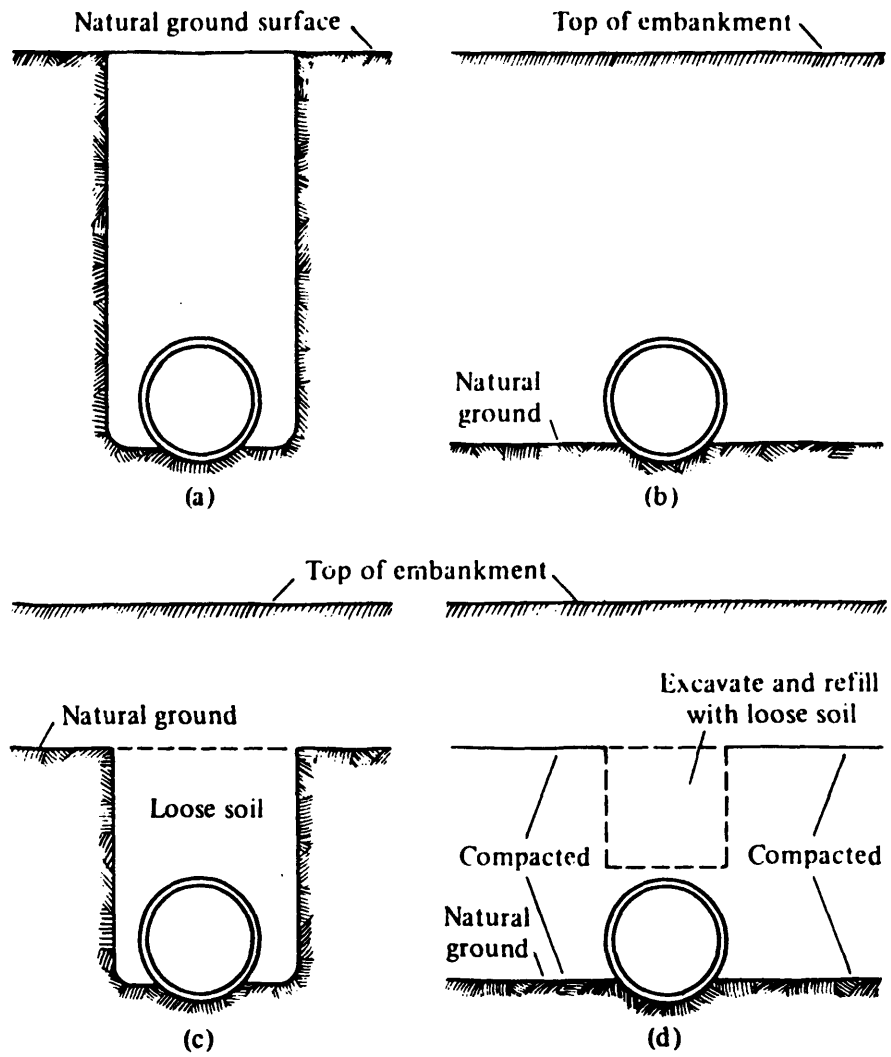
Various Classes of Conduit Installations: (a) Ditch Conduit, (b) Positive Projecting Conduit, (c) Negative Projective Conduit, and (d) Imperfect Ditch Conduit (Spangler & Handy, 1973)
